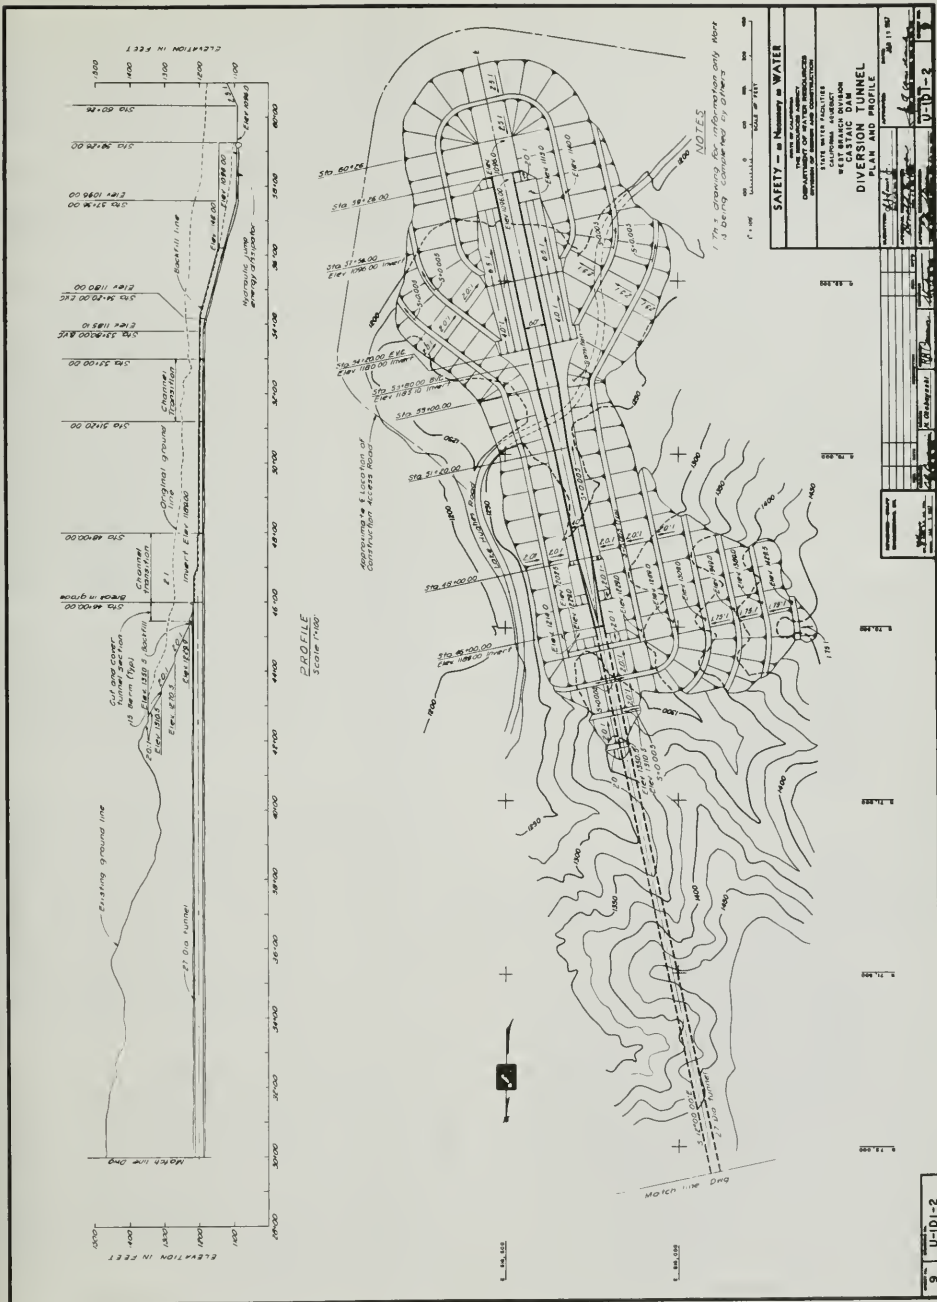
Diversion Tunnel—Plan and Profile (Continued)
